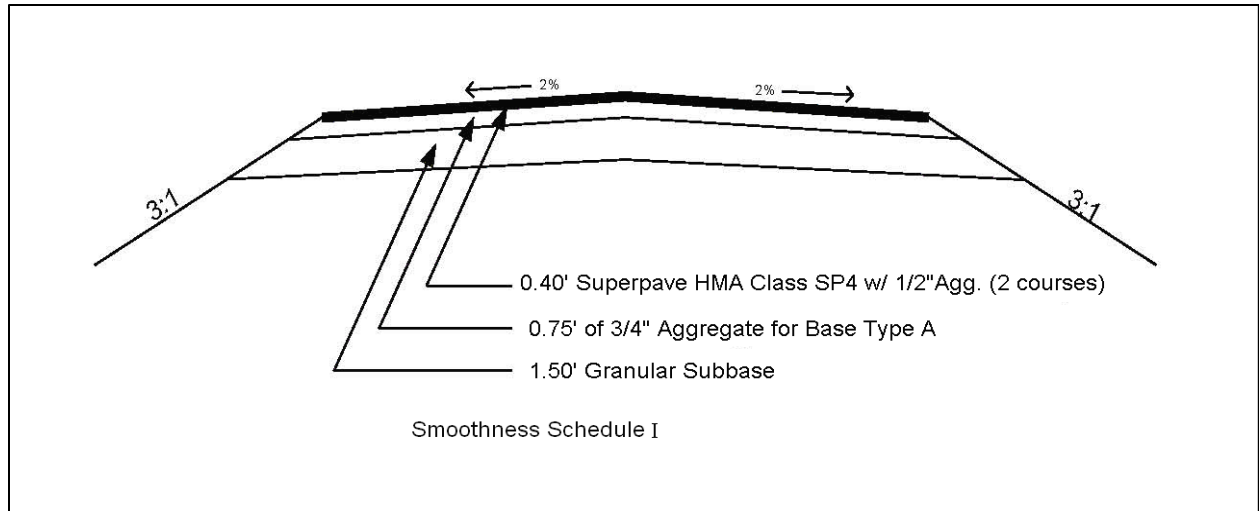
Pavement Typical Section Example 240.22.02.02 Example 2 Typical Section Table.
